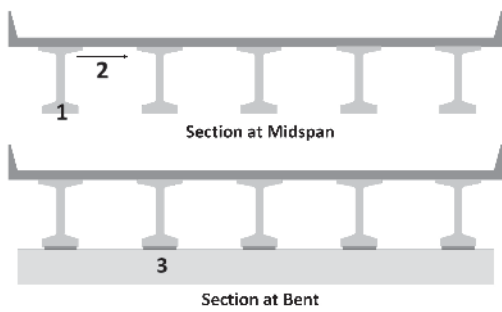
Load path redundancy in a pretensioned concrete girder bridge with a reinforced concrete deck.
